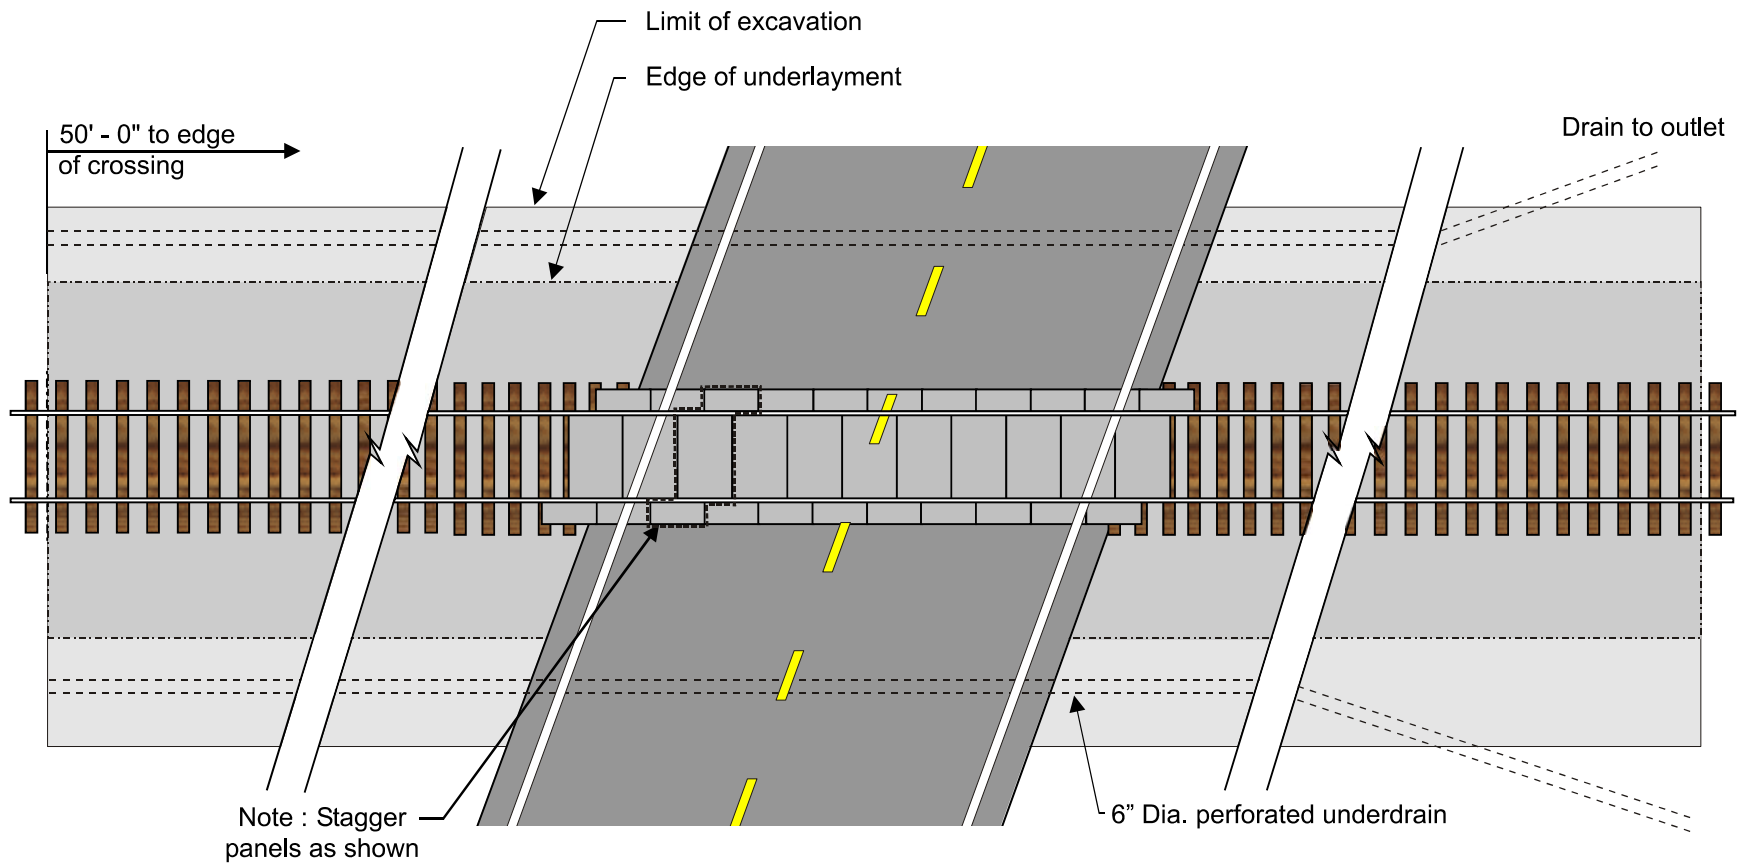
Profile View of Reconstructed Rail Crossing Using Steel-Reinforced Rubber Panels.
